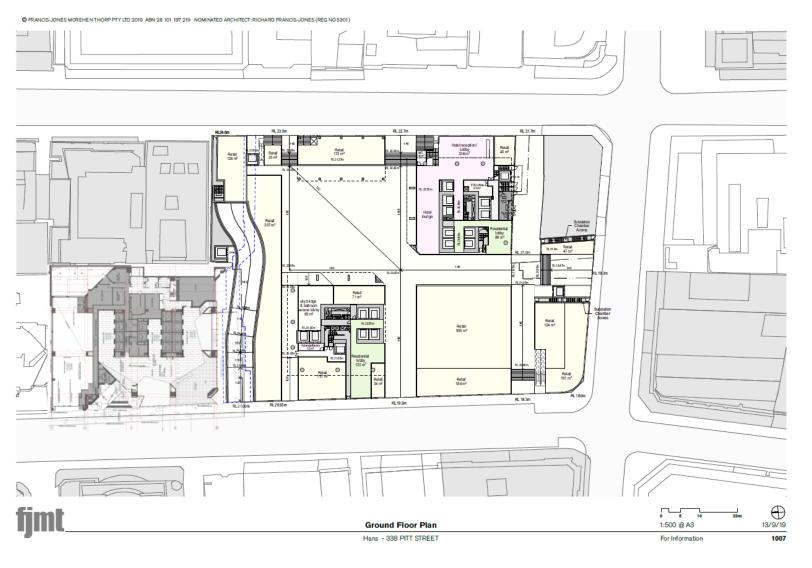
Proposed ground floor plan. Francis-Jones Morehen Thorp Pty Ltd, September 2019.
